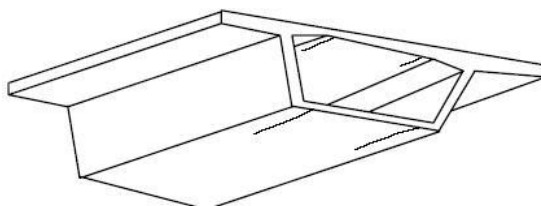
Temperature Cracks Thermally Induced Cracks at Box Girder Cross Section
